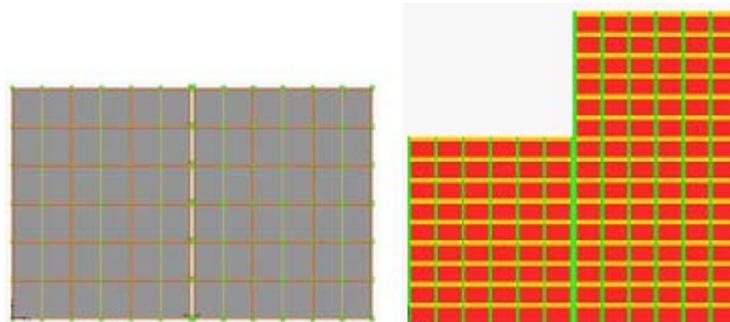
Plan Layout of Nine and Fifteen Storey Adjacent Buildings with Mixed Brick Infill Walls and Shear Walls
